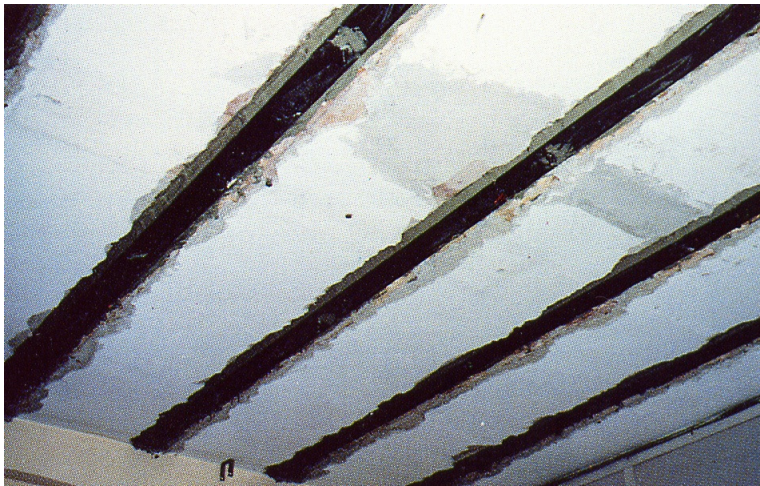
Repairing by attaching steel plates (Mazzolani) [159]
